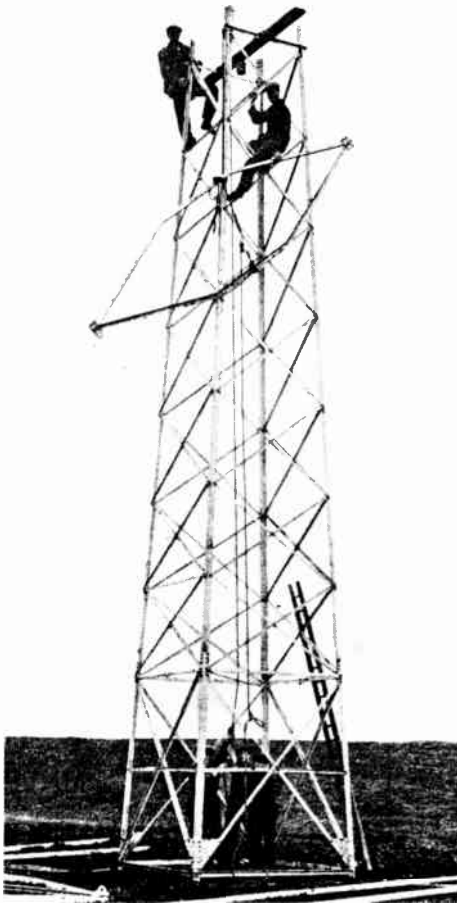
ERECTING THE STEEL TOWER PIECE BY PIECE IN A VERTICAL POSITION.
